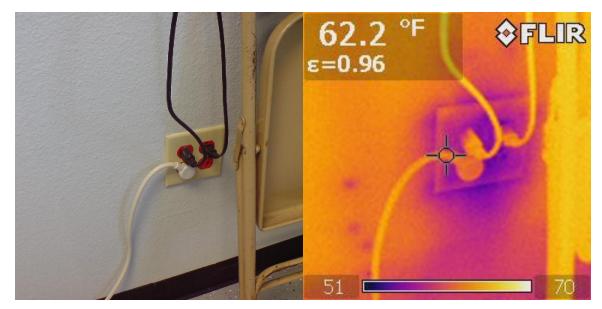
Infiltration Detection—Electrical Outlet on Exterior Wall
